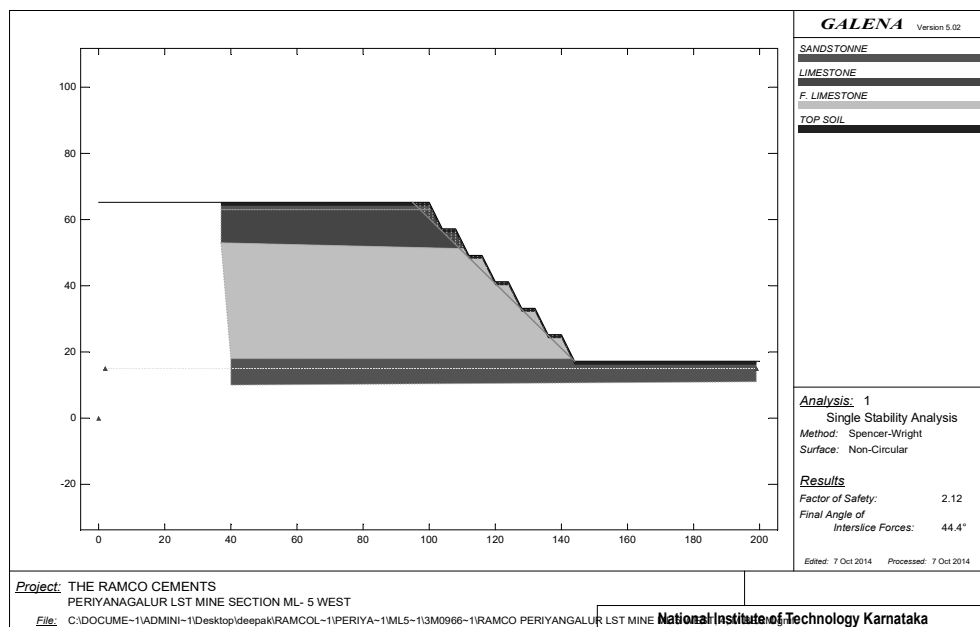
Analysis of slope along Section –ML-5 West for planned pit configuration (3 m width)
